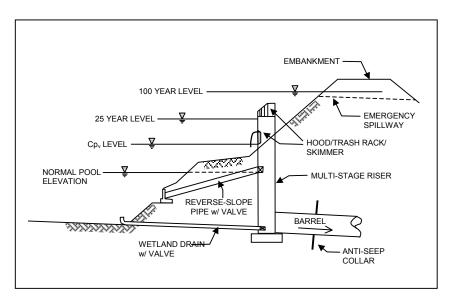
Typical Wetland Facility Outlet Structure
